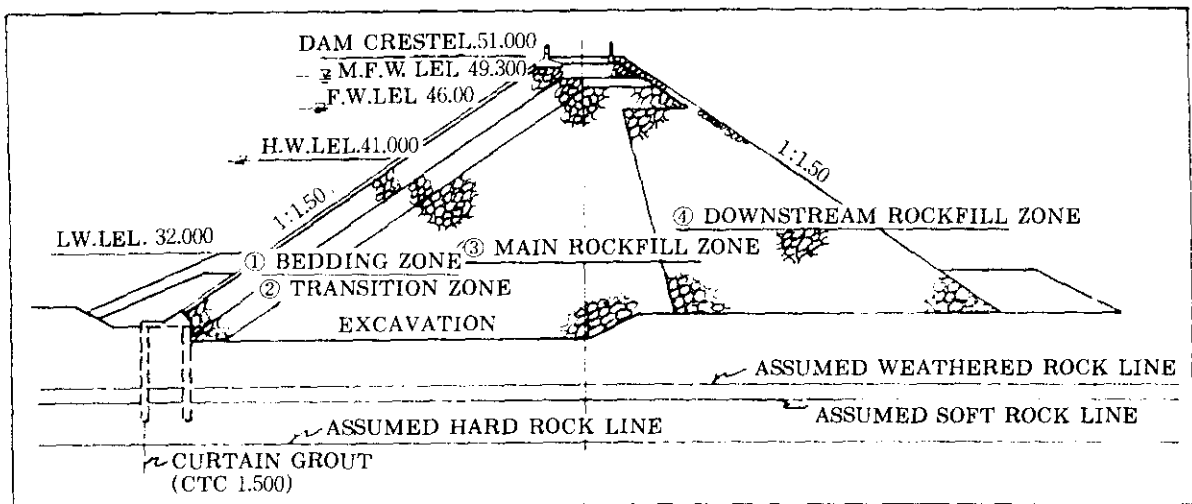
Typical section of concrete face rockfill dam(Namgang dam)
